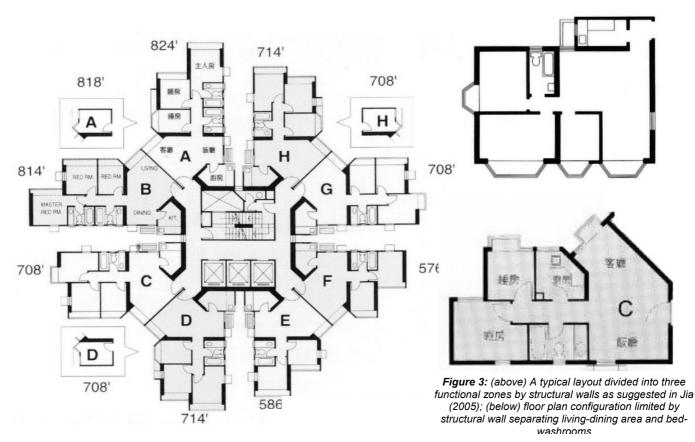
Typical cruciform without structural wall in between two adjoining units, units in "diamond" shape
